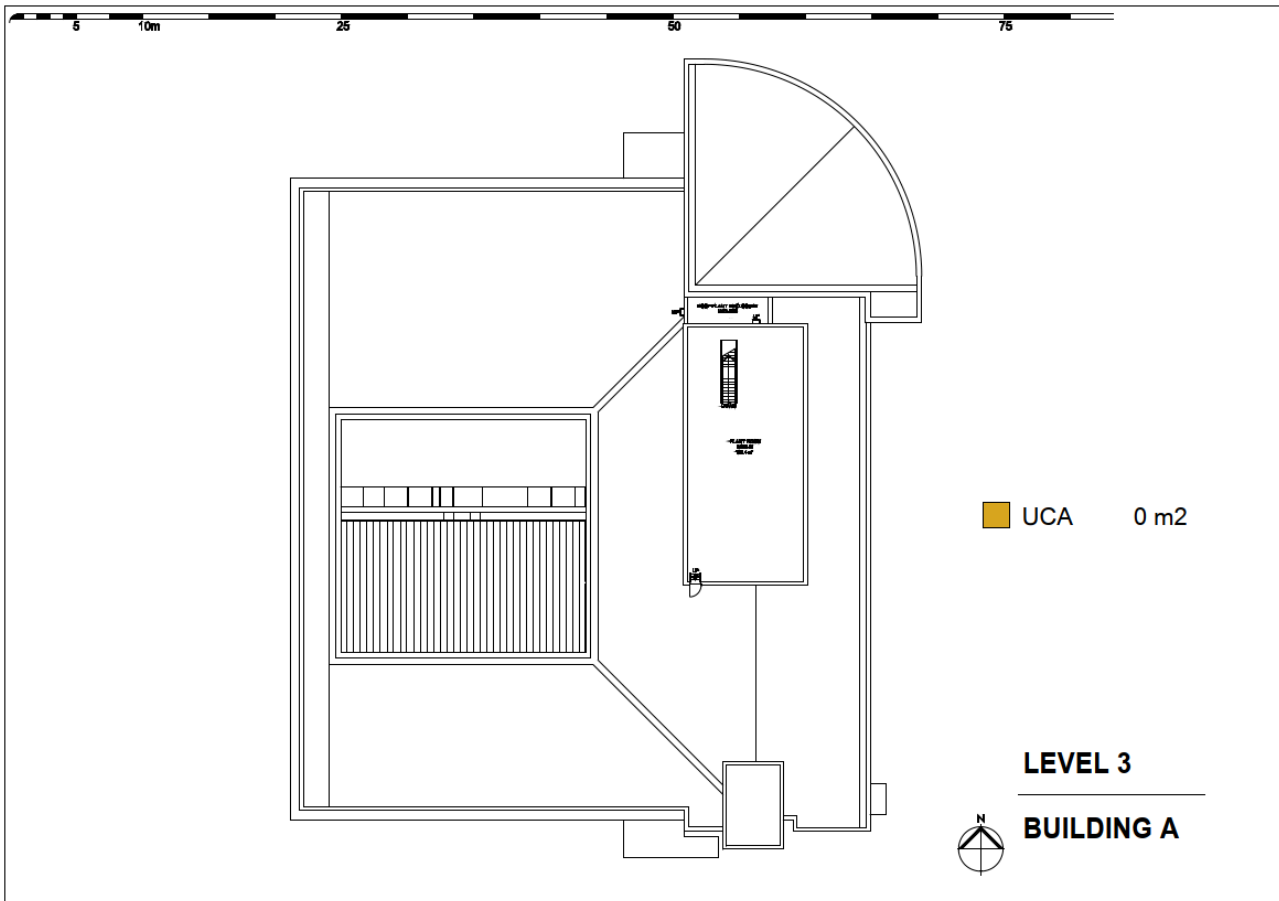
Building A – UCA – Level 3 (Roof Level)
